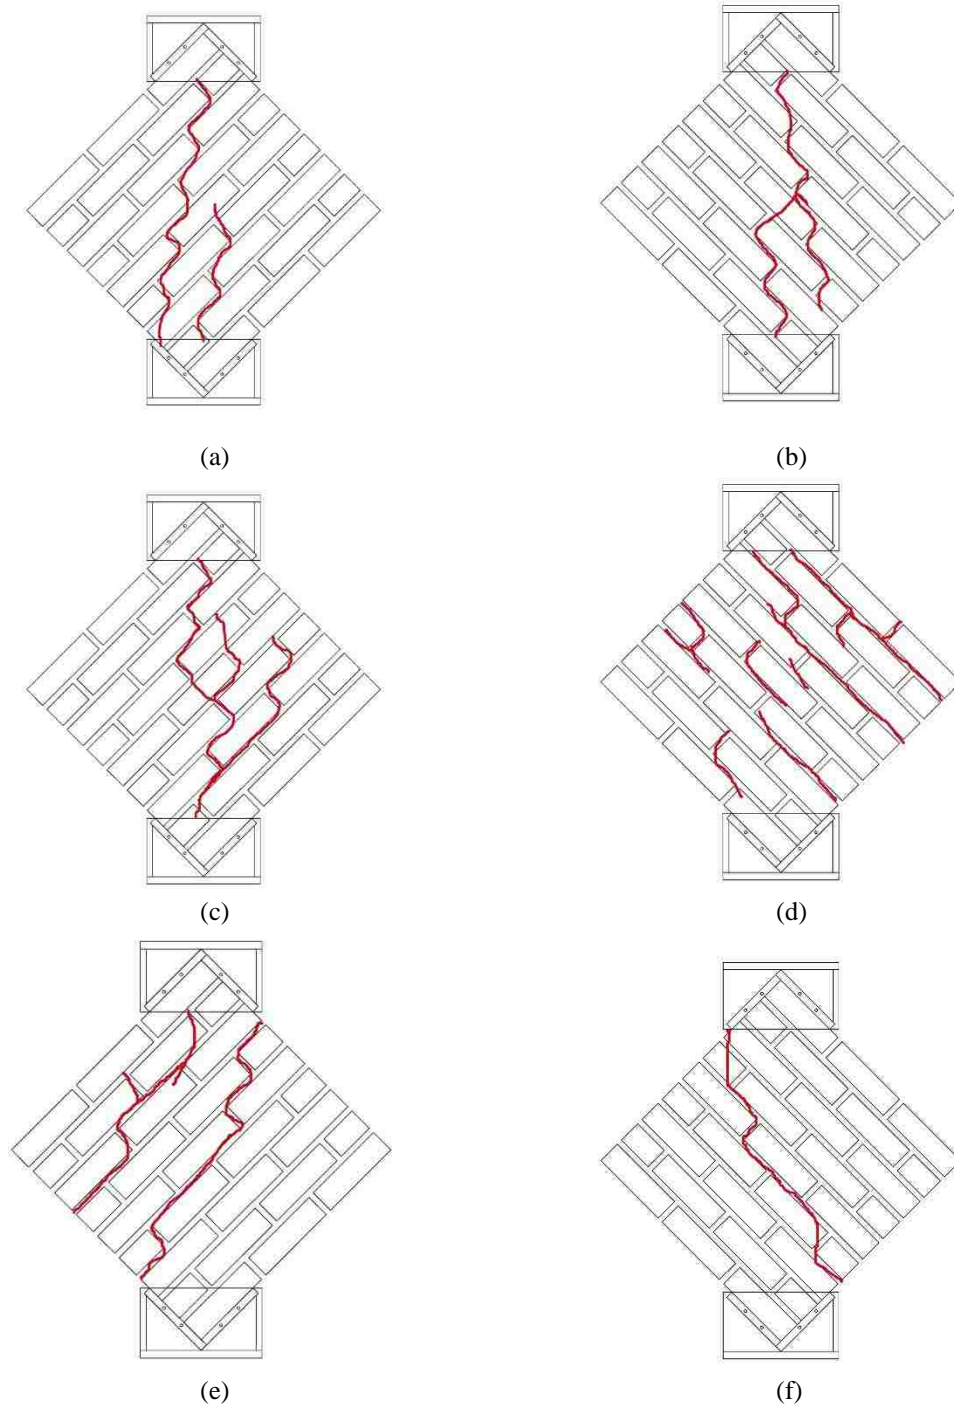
41. SCEB 7 Wall specimens under diagonal compression. Crack patterns are marked in red lines
